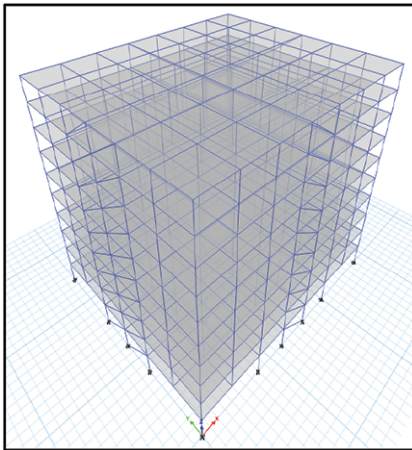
Regular model with floating column and bracing at Type-1 location – A4
